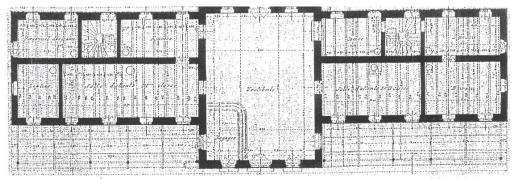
Ist class station building project drawn for Ankara-Eskişehir/ Ground floor plan. (Source: Araz, 1995)
